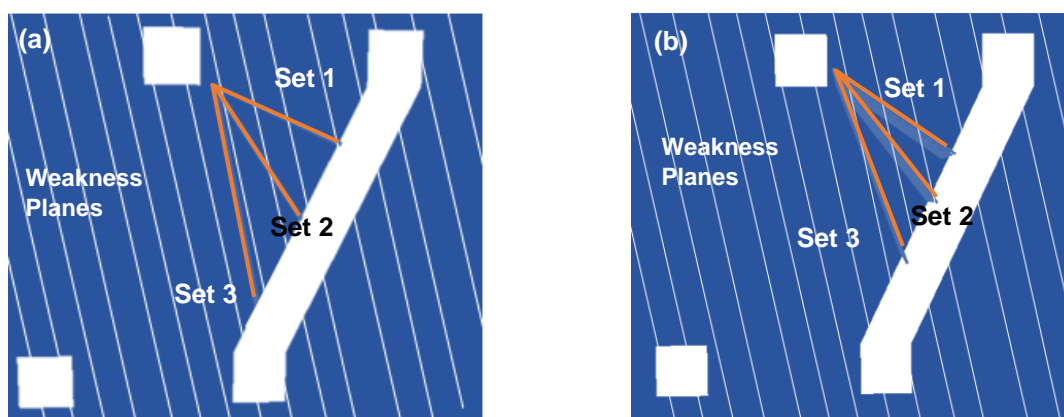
Cross-section at the mid-strike length of the stope showing the planes of weakness and installed cable bolts according to (a) pattern 1 - larger cable bolt toe spacing and (b) pattern 2 - smaller cable bolt toe spacing.
